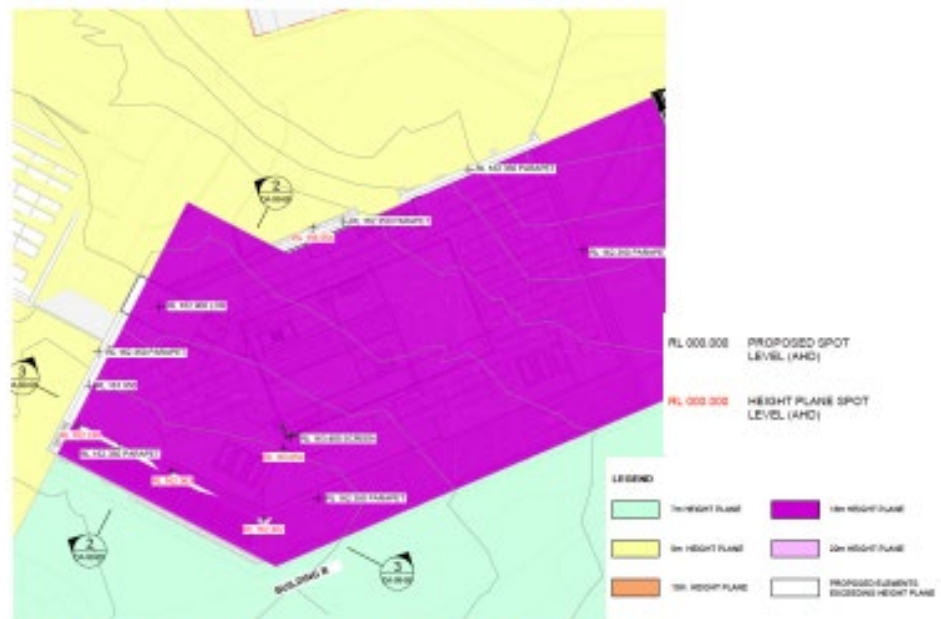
Height exceedance plan – Buildings B (Cox drawing DA-99-06)
